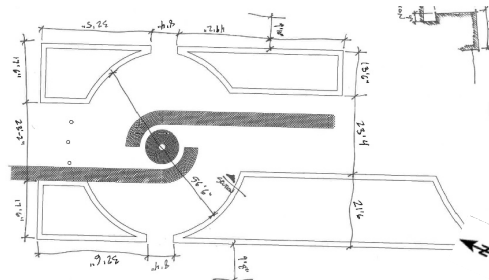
Existing Project Site, Plan View (provided by Selser Schaefer Architects)
